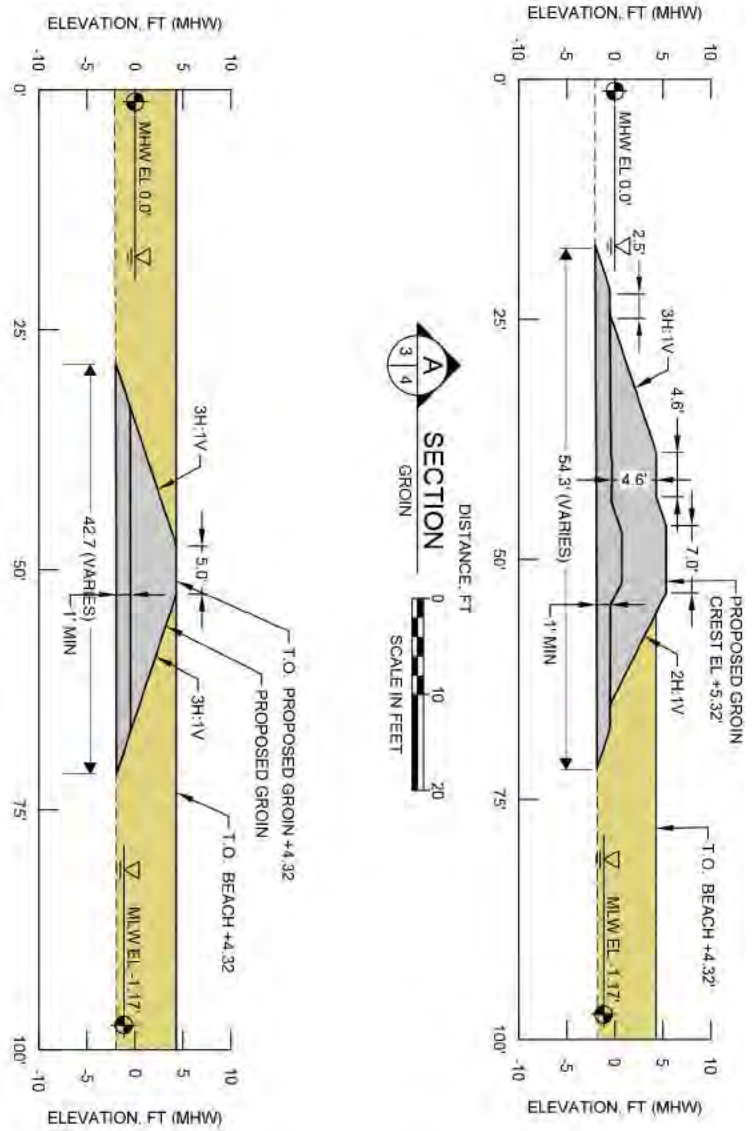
B. Cross sections of the proposed beach nourishment areas and protective structures.
